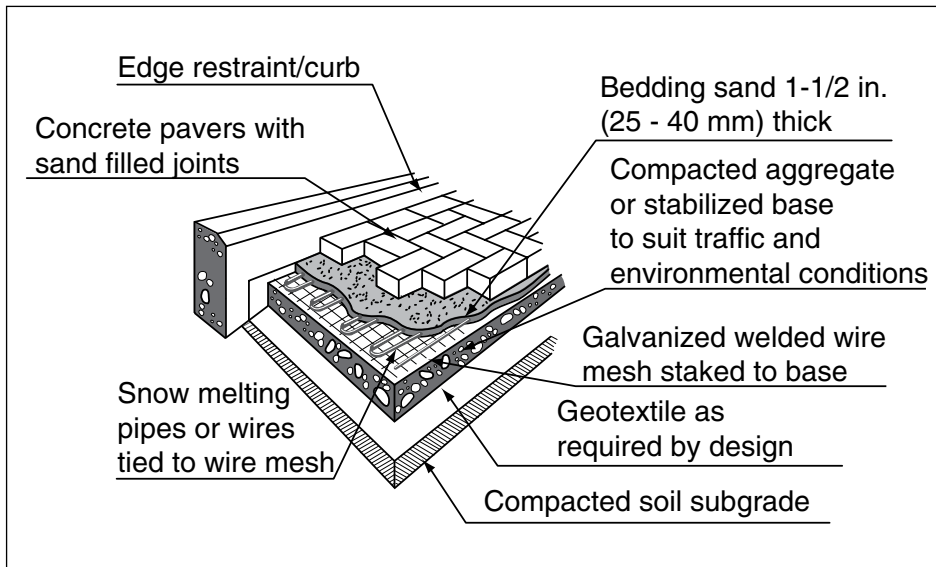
Typical components of a snow melting system for interlocking concrete pavements
